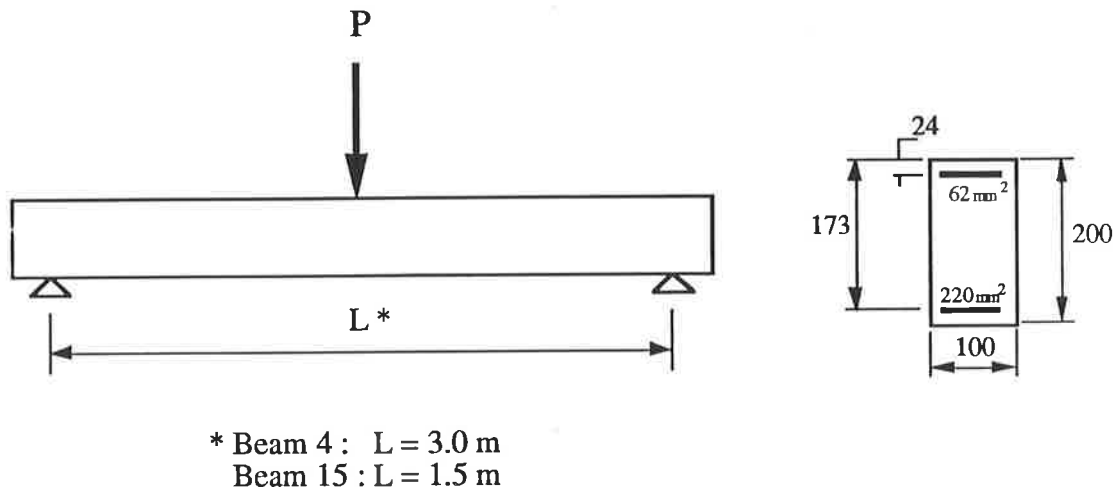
Test set-up and section details for beam tested by Healey (1993)
